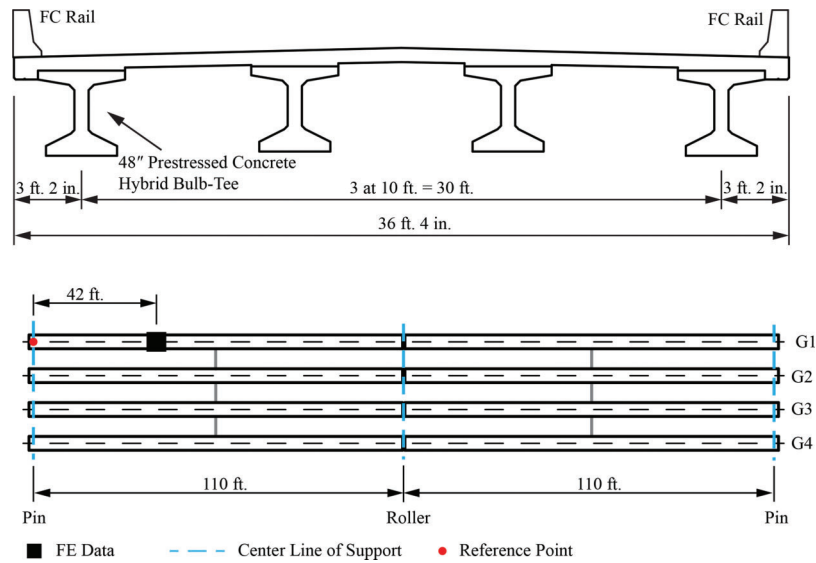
Cross-section and frame plan of the two-span continuous prestress girder bridge.
